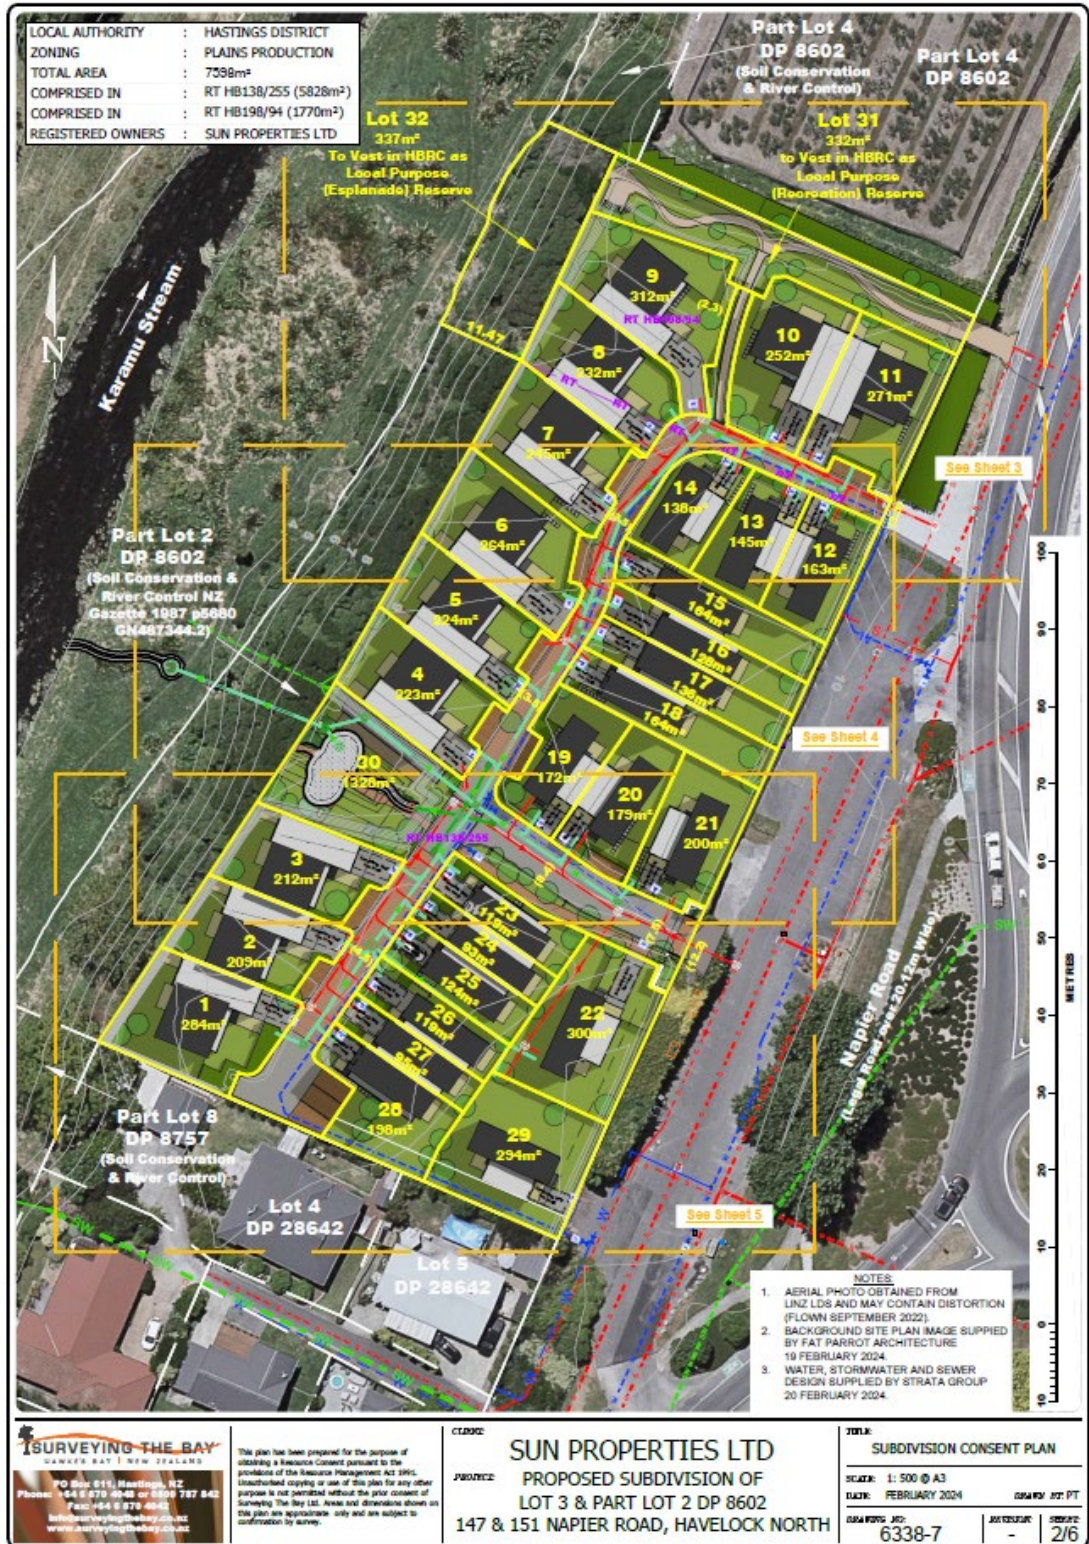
Proposed Scheme Plan (Surveying the Bay)
